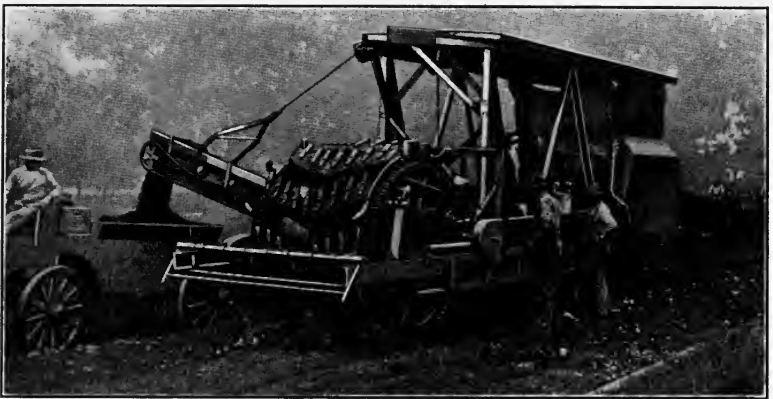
Turbine traction grader on street construction. (Courtesy of Koehring Machine Co.)
